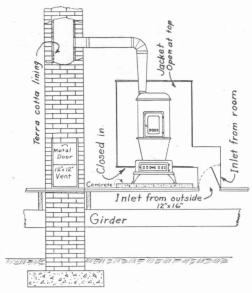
Jacketed stove for use in sweet potato storage houses.
